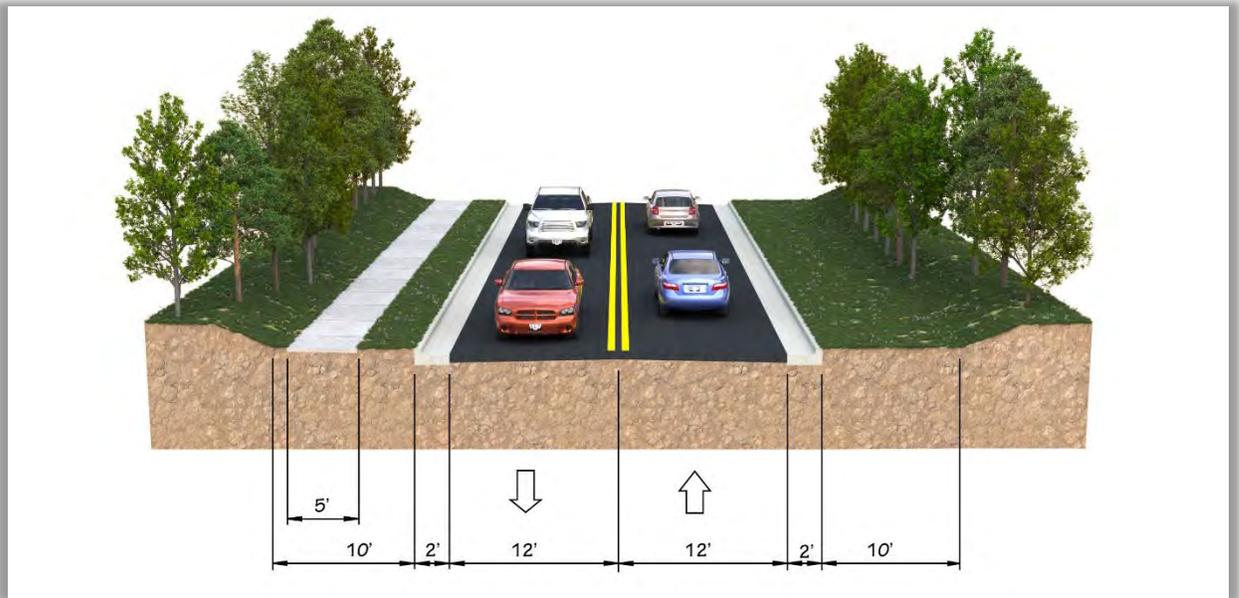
East Frederick Law Olmsted Way Extension Proposed Typical Section
